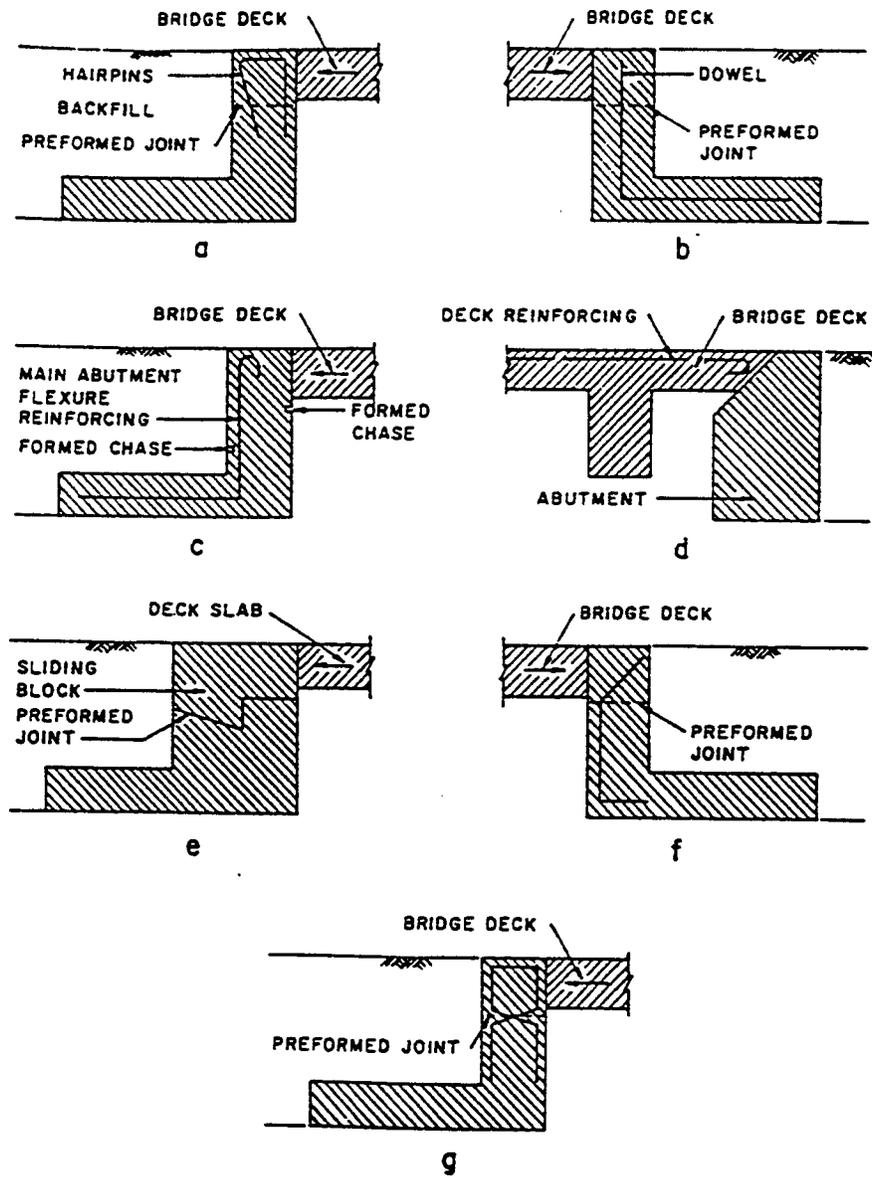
Reinforced Concrete Seat Type "Short Height" Abutment
